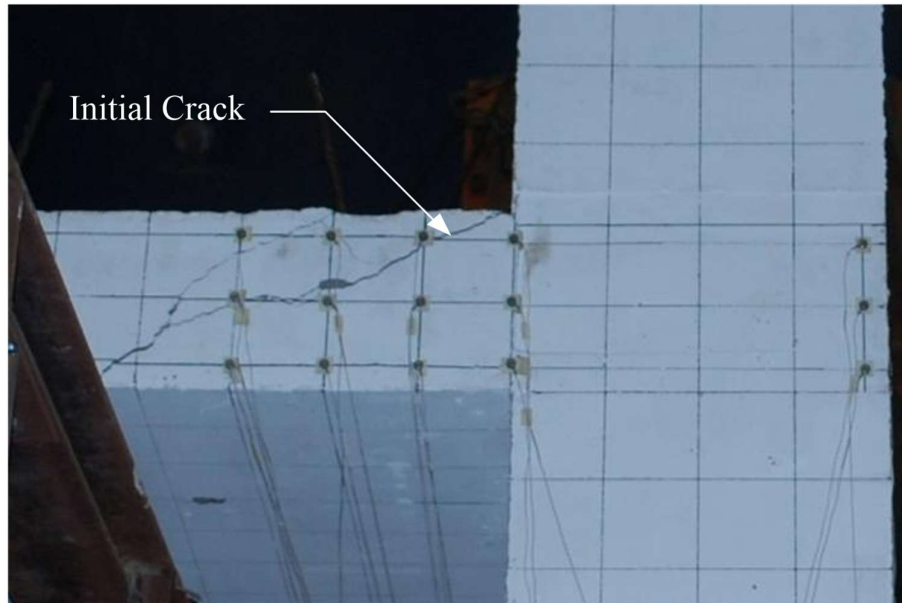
Initial crack on the North Face of the Slab of Specimen R3
